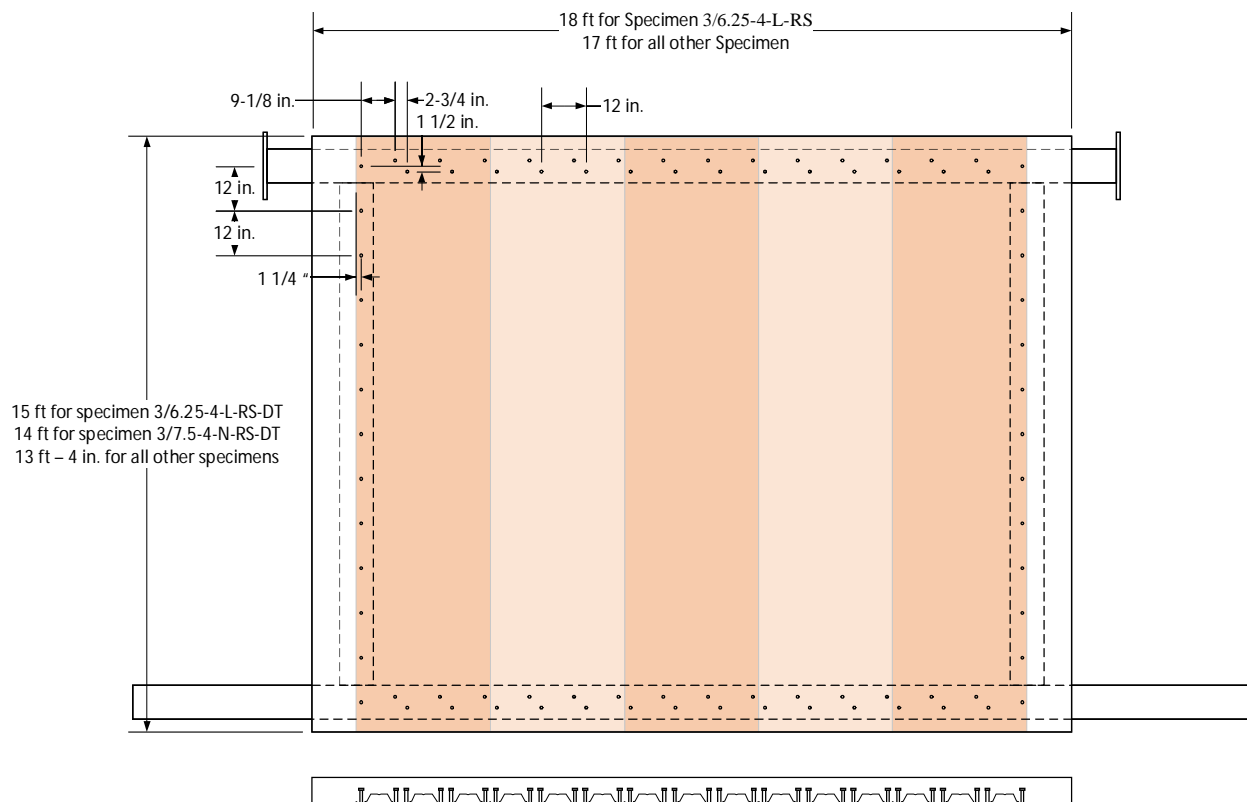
Headed Stud Placement for Typical Specimen Designed for Diagonal Tension Failure
